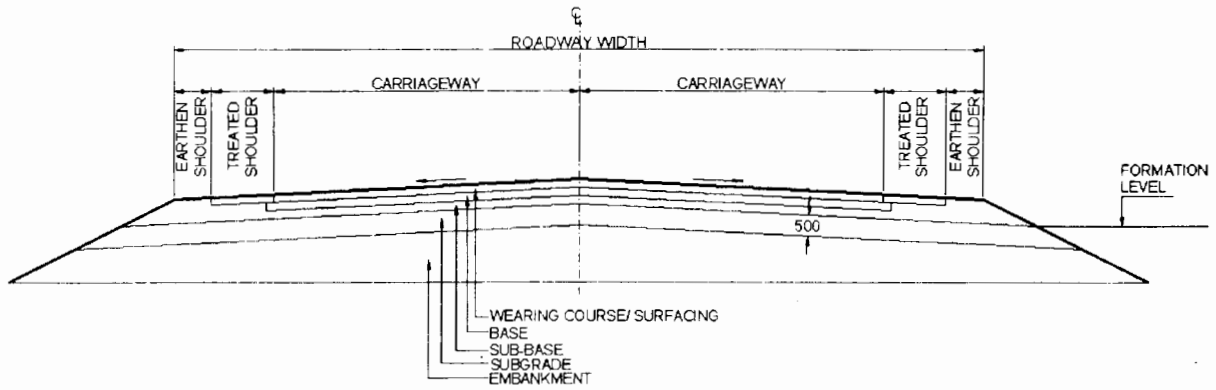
Terms Used in the Specifications to Describe Road Cross-Section Elements with a Flexible Pavement
